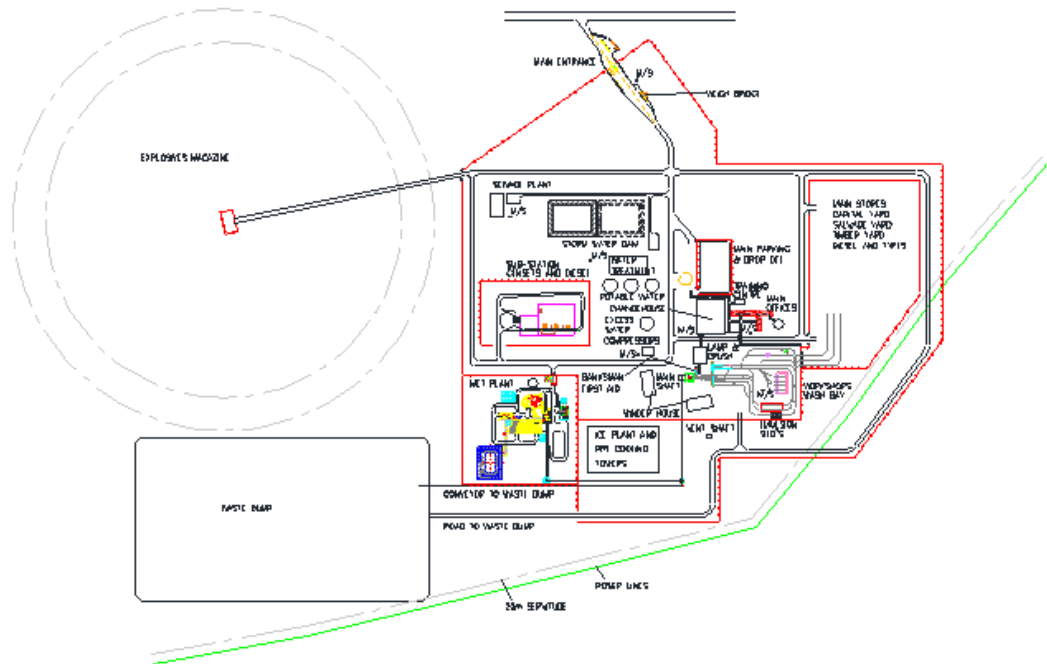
PROPOSED SURFACE INFRASTRUCTURE LAYOUT FOR THE DBM GOLD MINE
